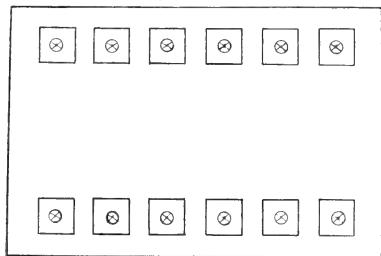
TYPICAL MILL-ROOM LAYOUT.
